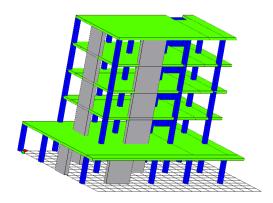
Showing incorporated CMCS Recommended Shear Walls
